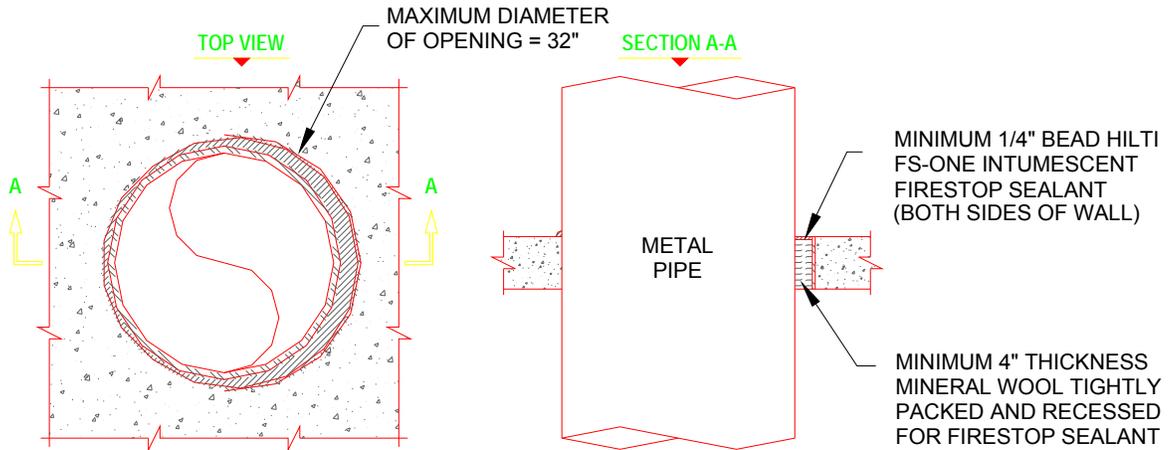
BUILDING SERVICES FLOOR OPENING FIRE STOPPING
